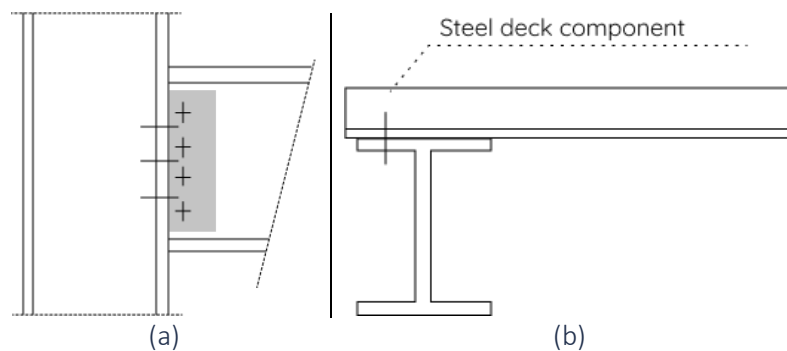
Example of bolted connection: a) Column-beam connection. b) beam-steel deck connection
